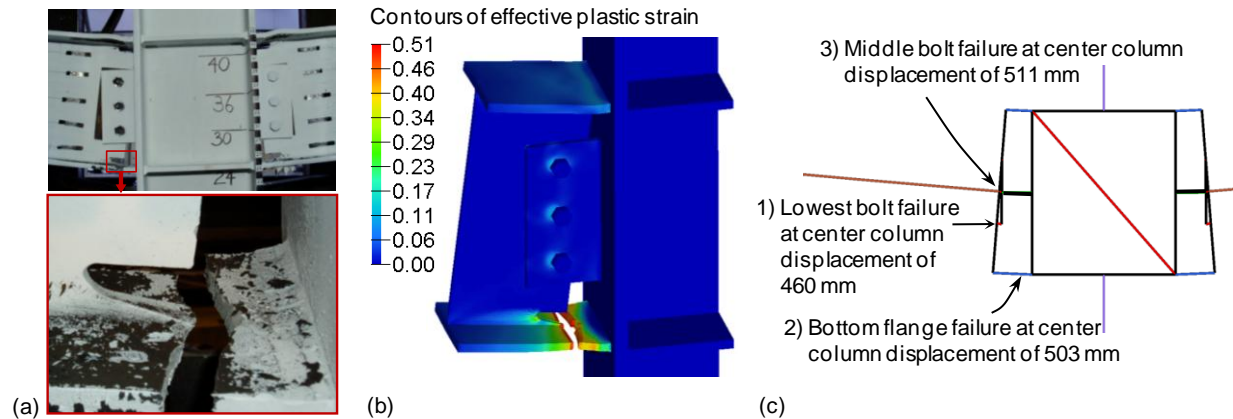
Failure mode of WUF-B connection at center column: (a) photographs of test specimen; (b) detailed model; (c) reduced model.
